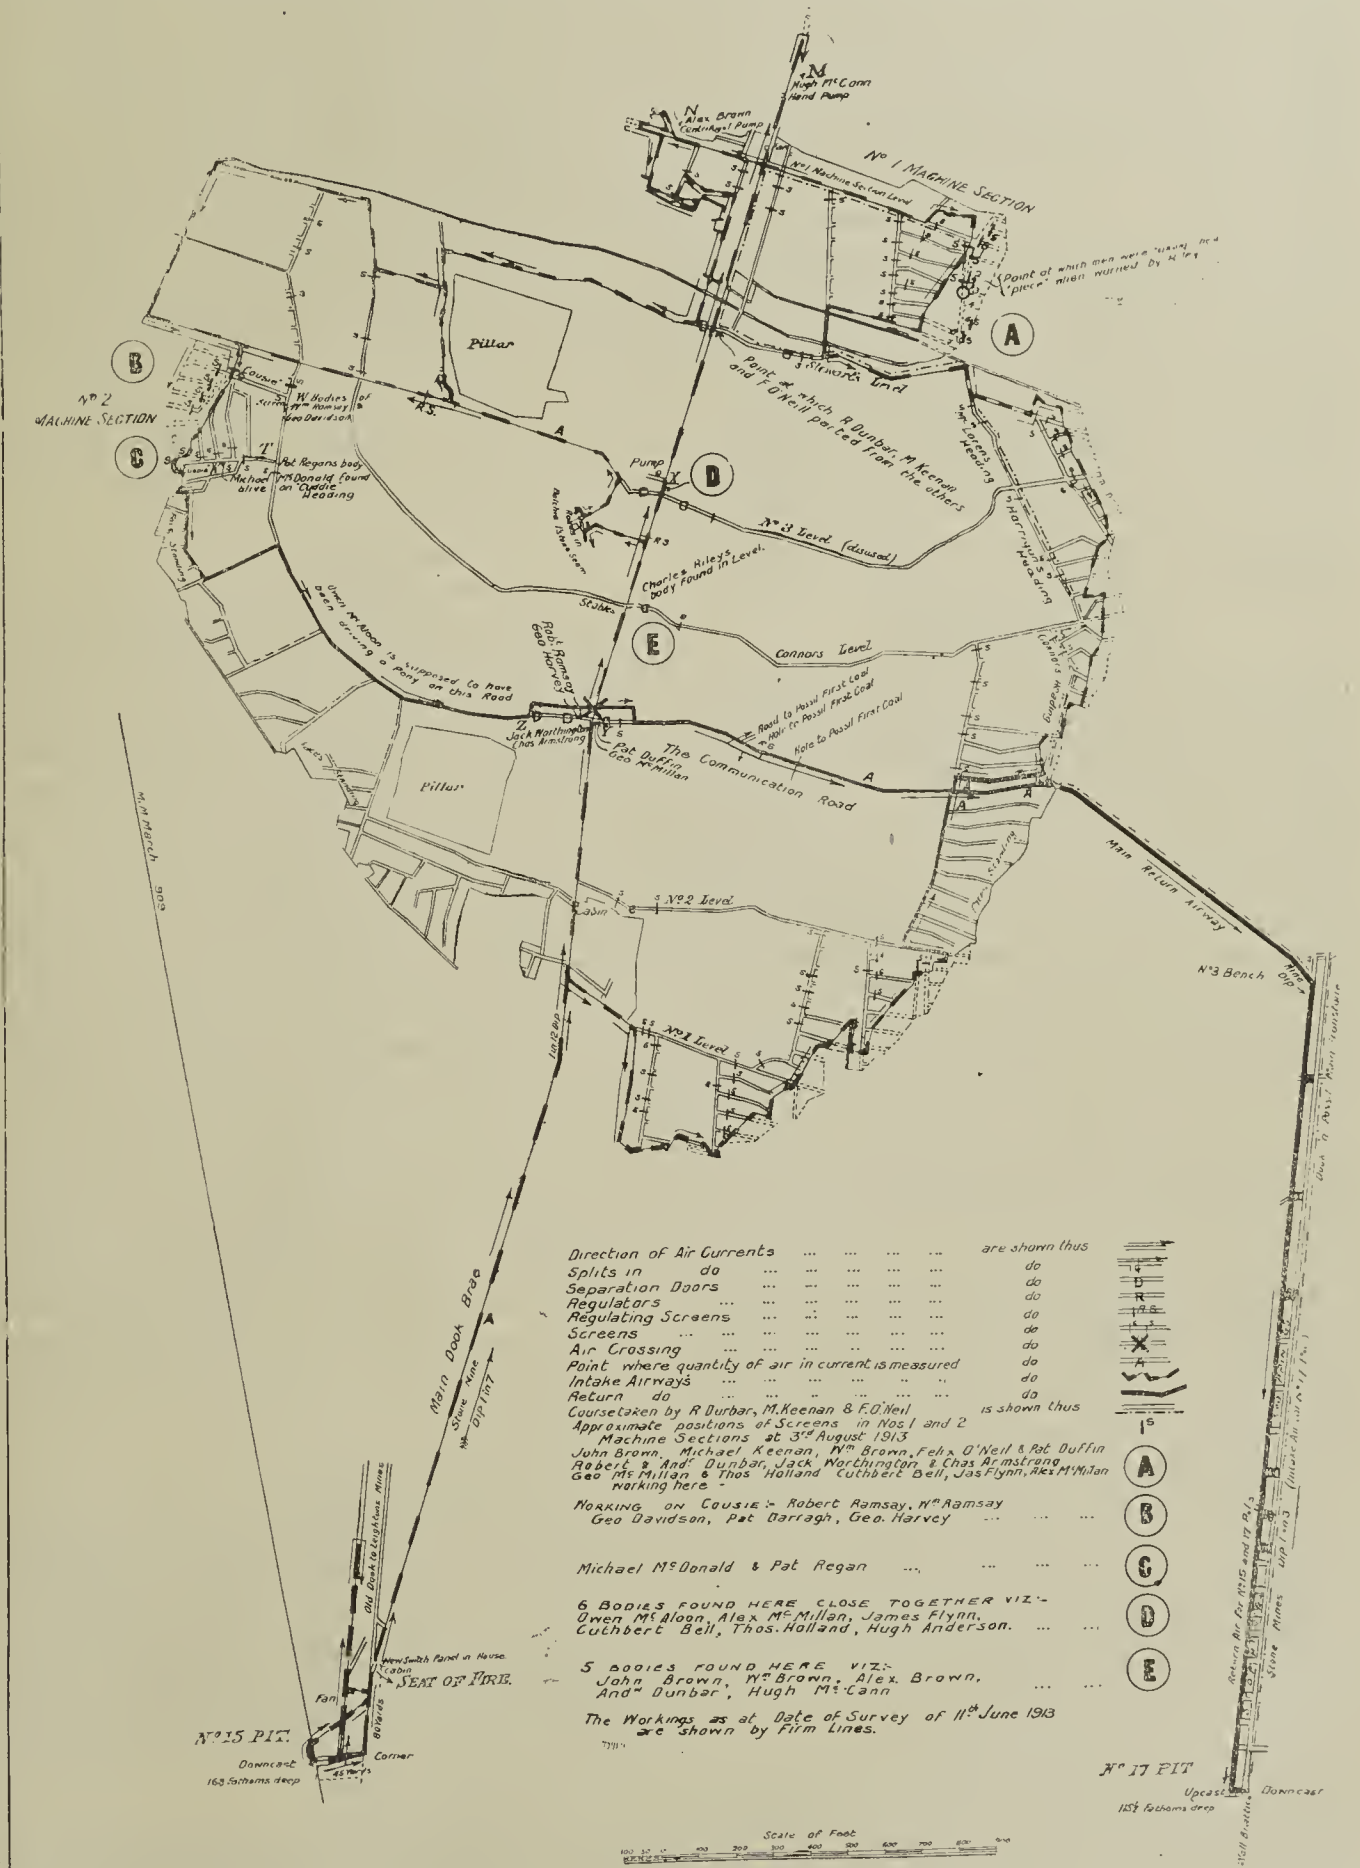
PLAN OF UNDERGROUND WORKINGS AT NOS. 15 AND 17 PITS.
